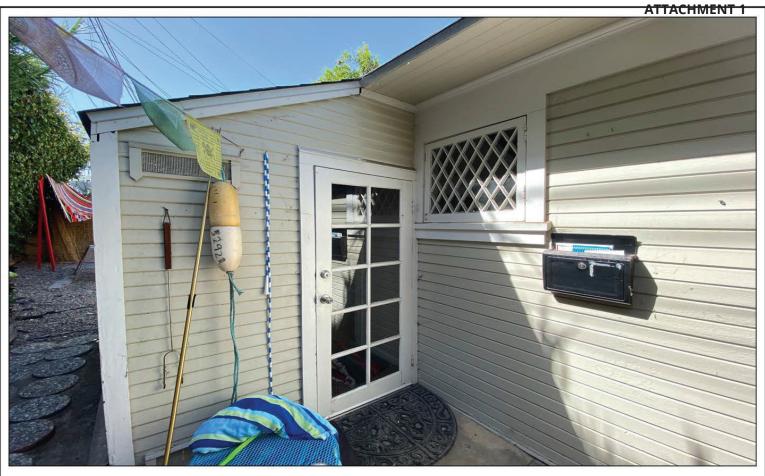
View of the North Façade of the 1949 to 1952 Addition (Left) and the East Façade of the Circa 1904 Dorothy Cottage (Right), Facing Southwest 825-827 Coast Boulevard South
